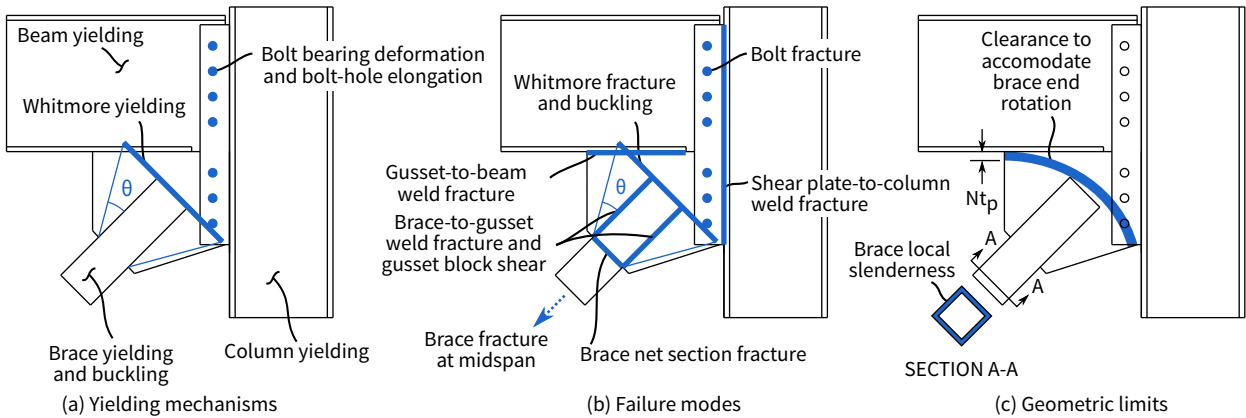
Common gusset-plate connection yielding mechanisms, failure modes, and geometric limits
